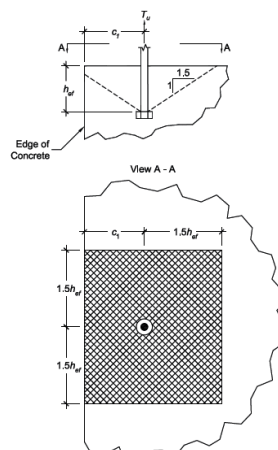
Breakout cone do to tension force near edge in concrete block [6]
